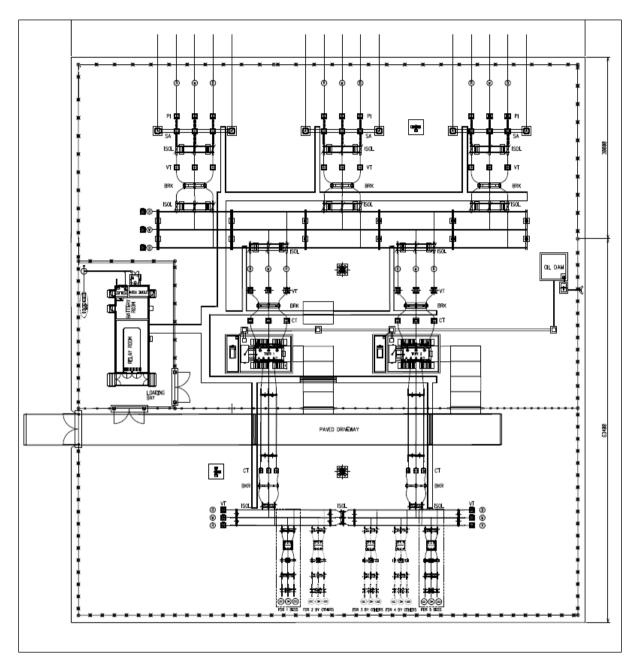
Typical Substation Layout (note: for illustration purposes only)
